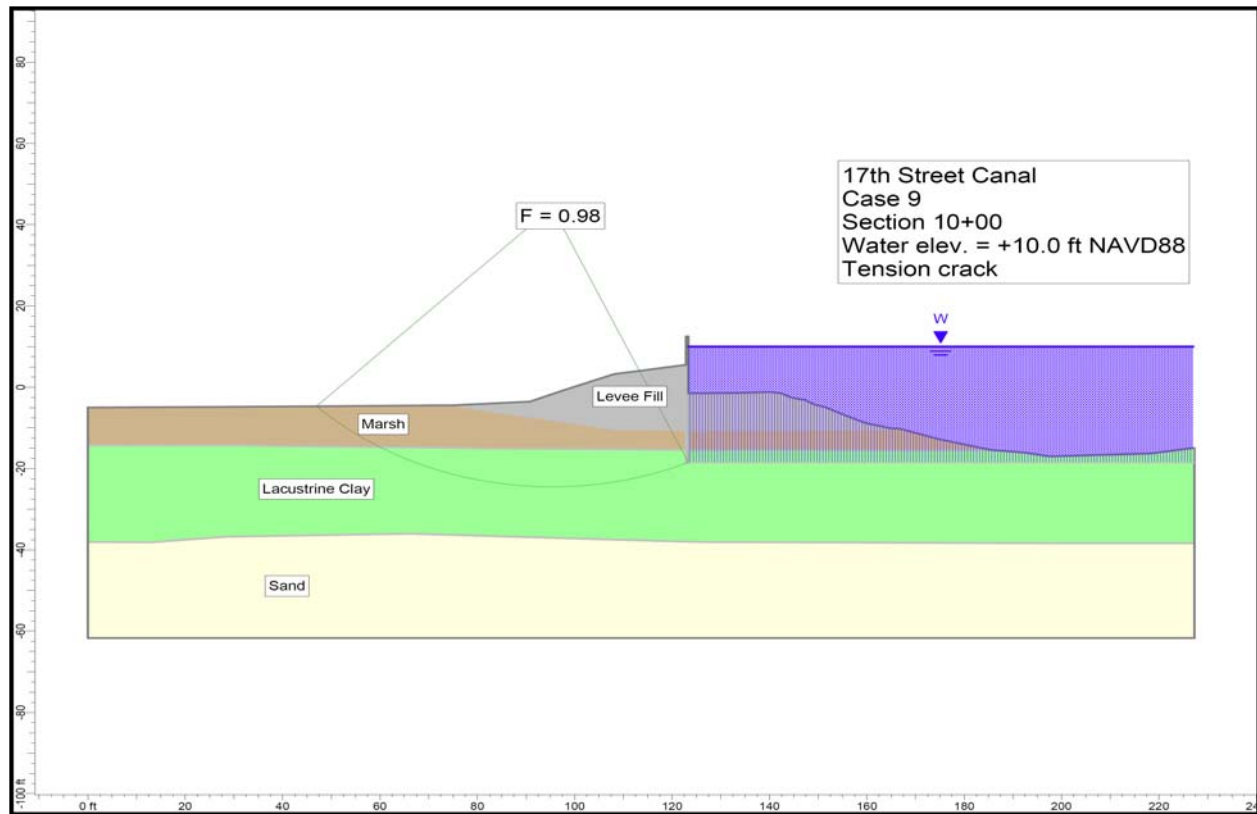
Critical circle for 17th Street Canal Station 10+00 – water elevation 10 ft, with a water-filled gap behind the wall.
